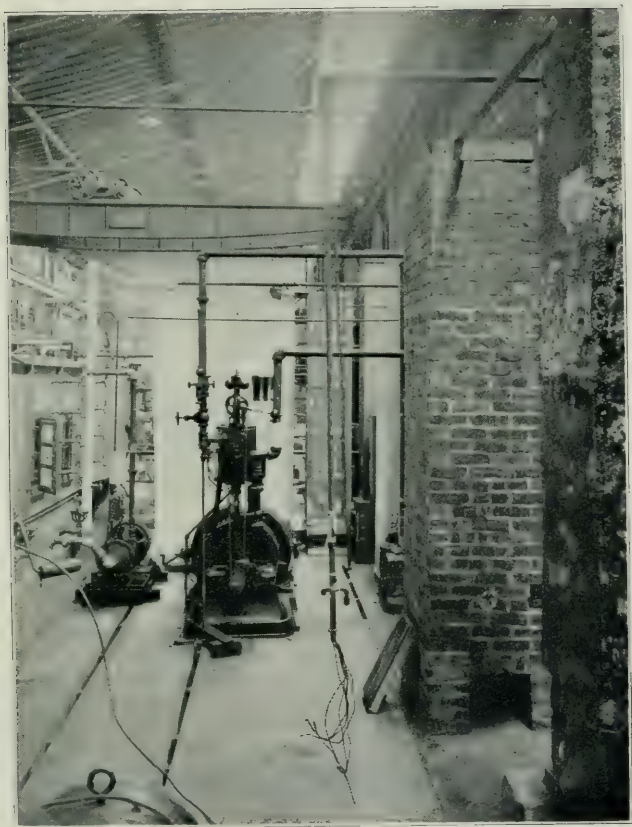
VIEW OF TEST COLUMNS SHOWING BRICK COLUMN
